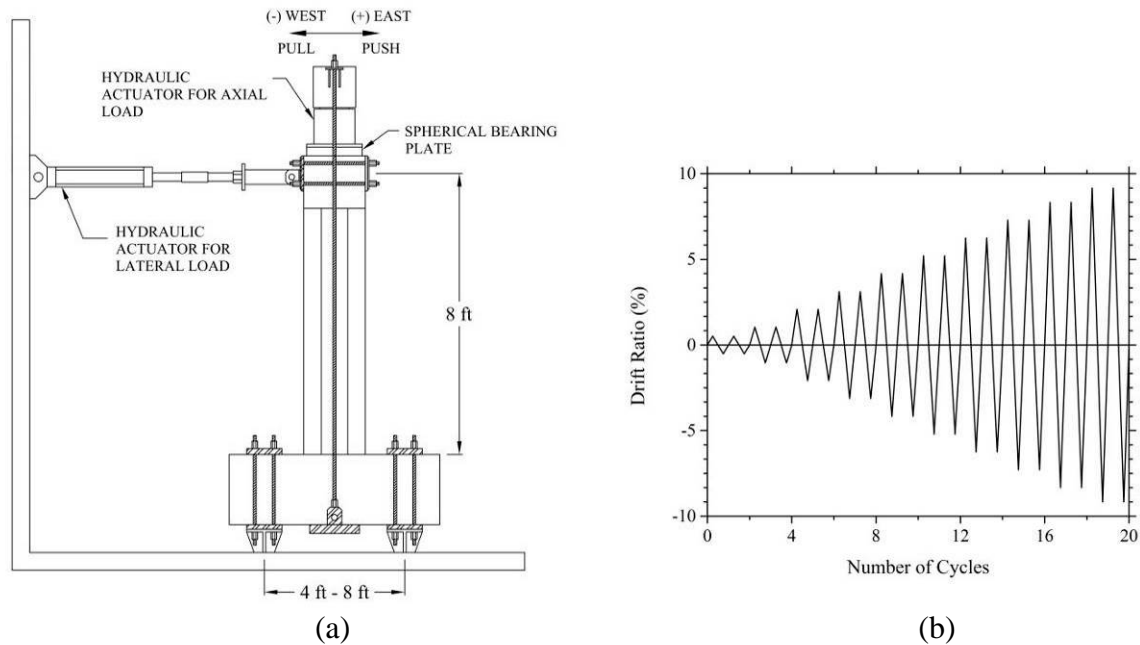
Test Assembly and Loading Protocol: (a) Test Assembly; (b) Loading Protocol. 1 ft = 304mm.
